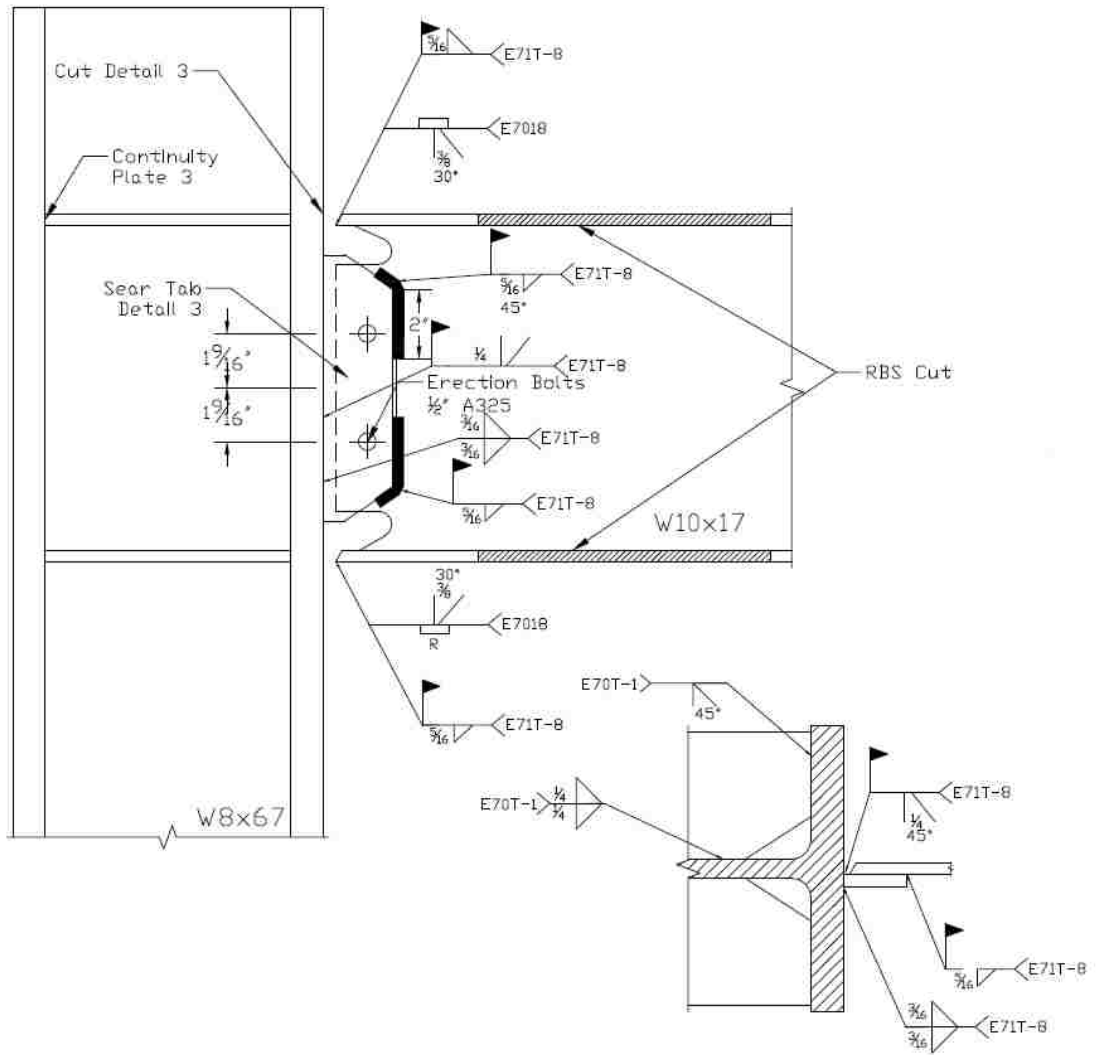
MRF 3rd Floor Beam-to-Column Connection Details
